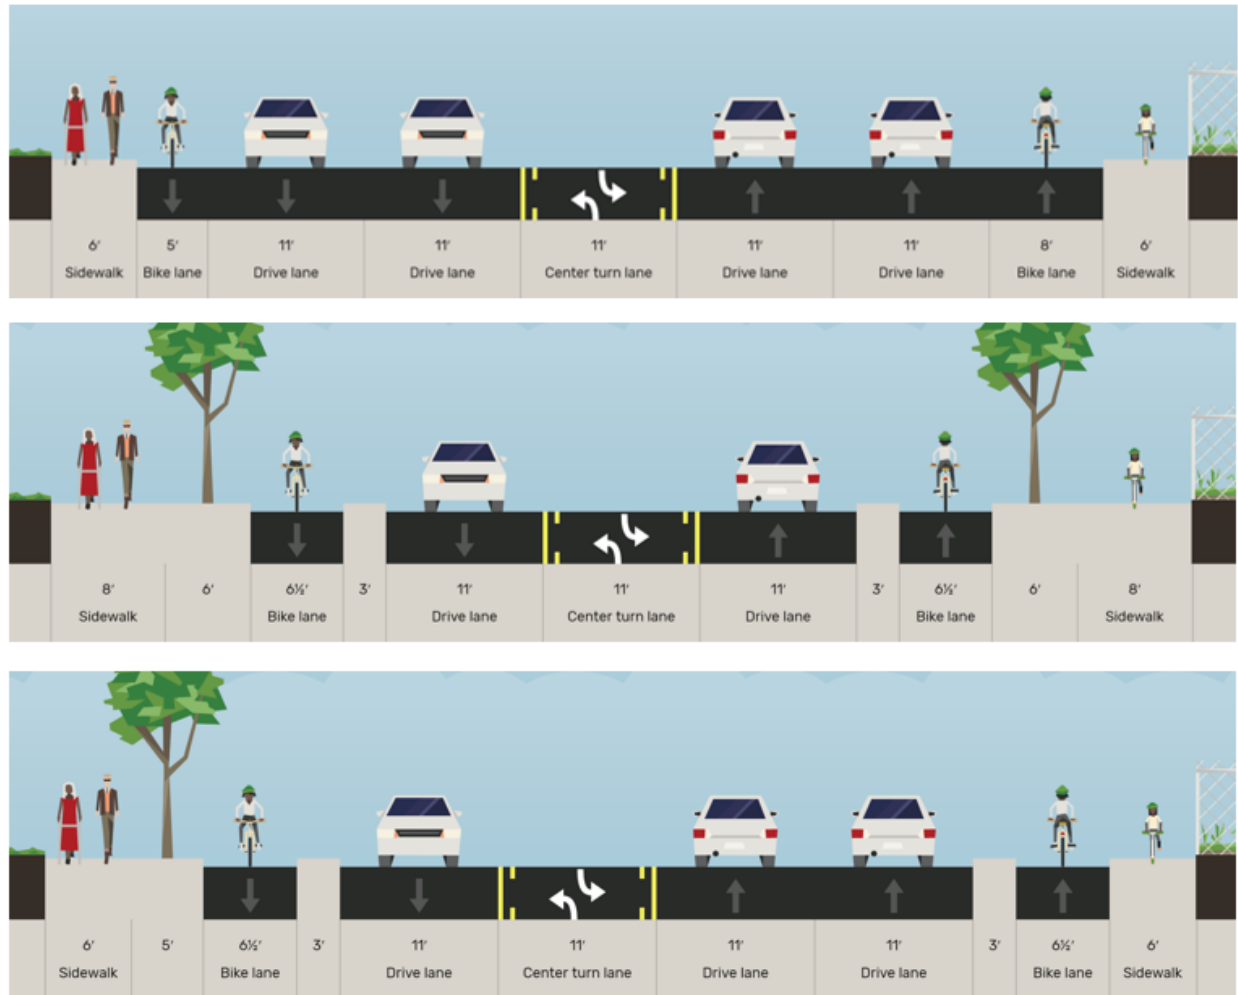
Old Auburn Road Cross Sections - Existing, Preferred Concept, and Sub-Alternative
